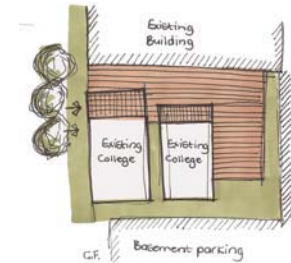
Ground floor plan of proposed Industrial Design Centre
